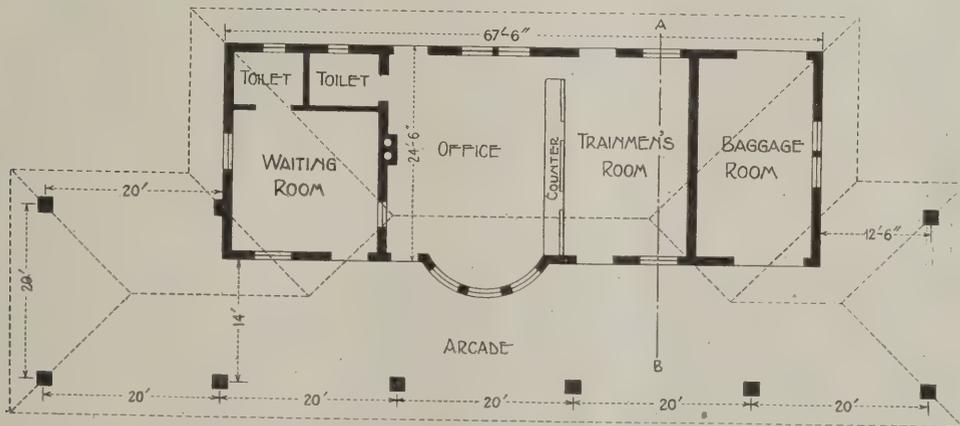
Ground Plan Before Removal—Scale 3/64 in. to the foot
